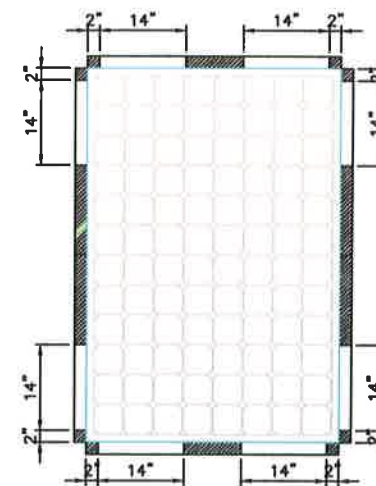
PLAN VIEW, TYPICAL ARRAY LAYOUT
